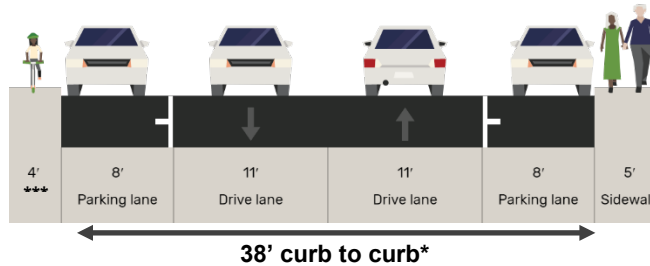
Section C (Butler Street - 62nd Street to One Wild Place) – Existing
